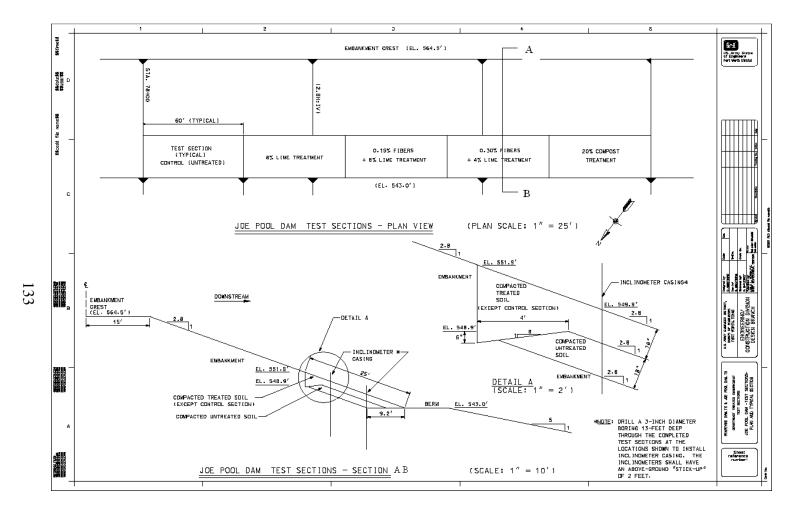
Plan and section showing the construction of test sections at Joe Pool Dam
